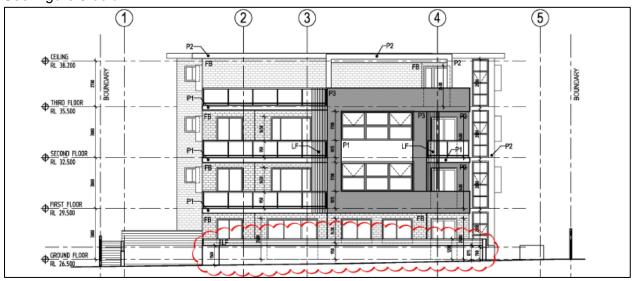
No. 161-163 Pennant Street – 4 Storey RFB – Affordable Housing
